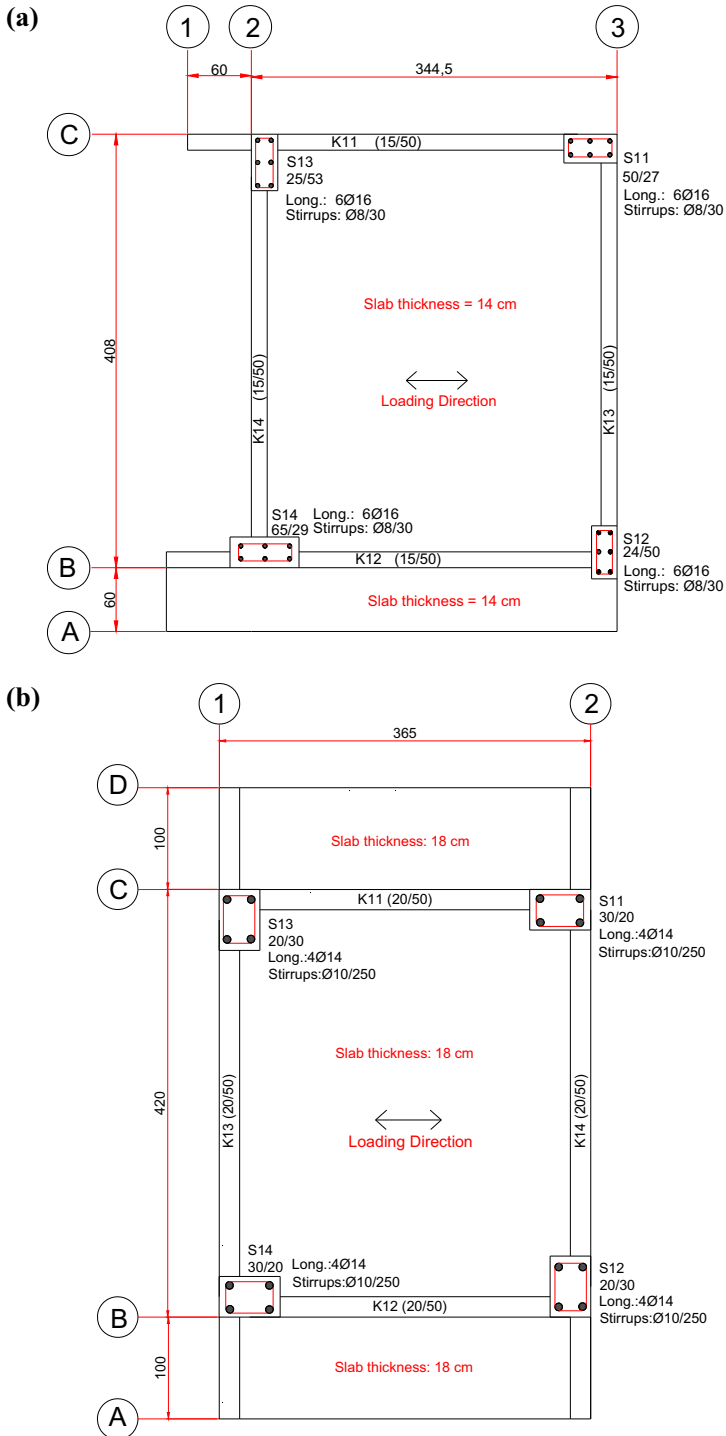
Plan and reinforcement layouts of a TB1 and b TB2 at 1st story
